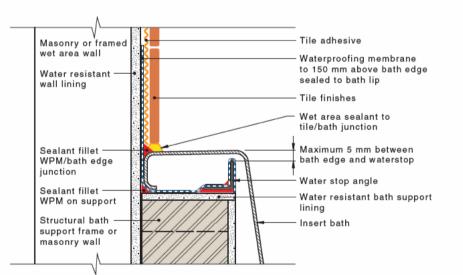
(B) — Shower over bath — Fitted bath — Fitted against wall
